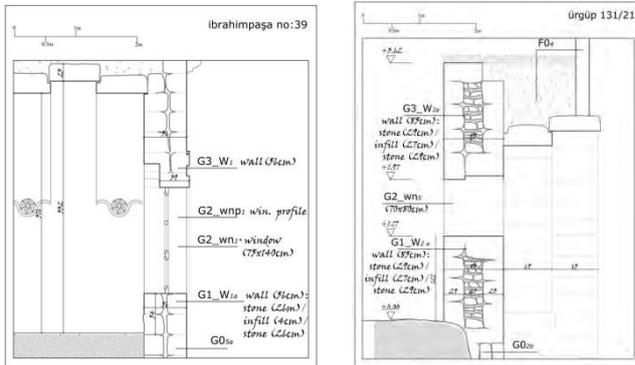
, Wall type 1a (cut-stone/infill/cut-stone)- Wall type 2a
